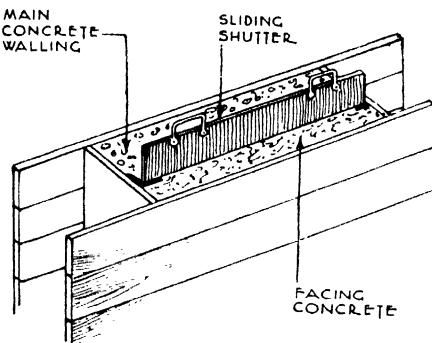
BUILDING WITH DIFFERENT MIXES OF CONCRETE
